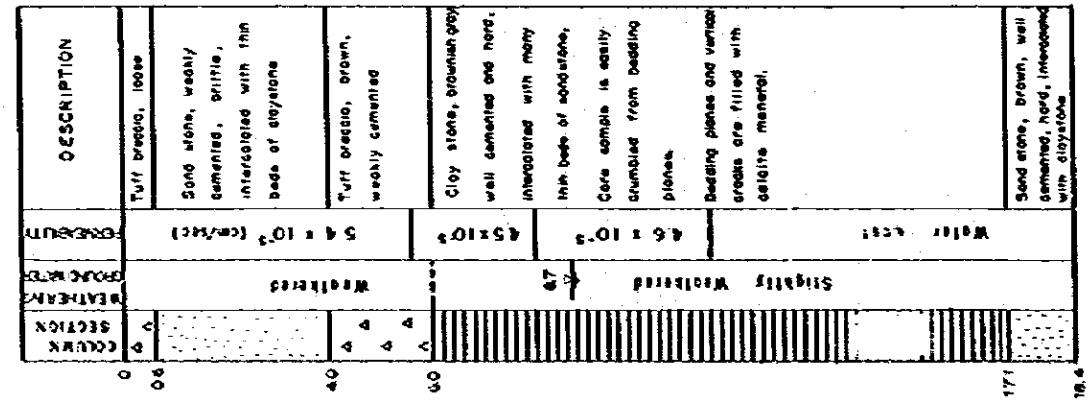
SUMMARIZED COLUMN SECTION OF INTAKE WEIR SITE (1/3)
